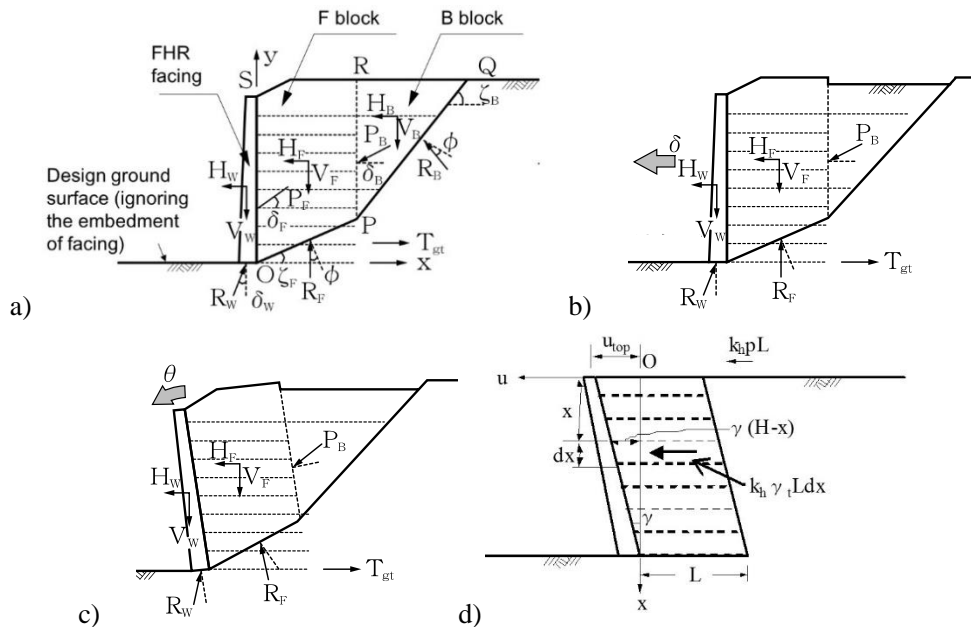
Evaluation of residual deformation of a typical GRS RW having staged constructed FHR facing: a) force components considered in the modified T-W method; b) sliding along failure planes; c) overturning about the center of the bottom of FHR facing; and d) shear deformation of reinforced backfill zone.
